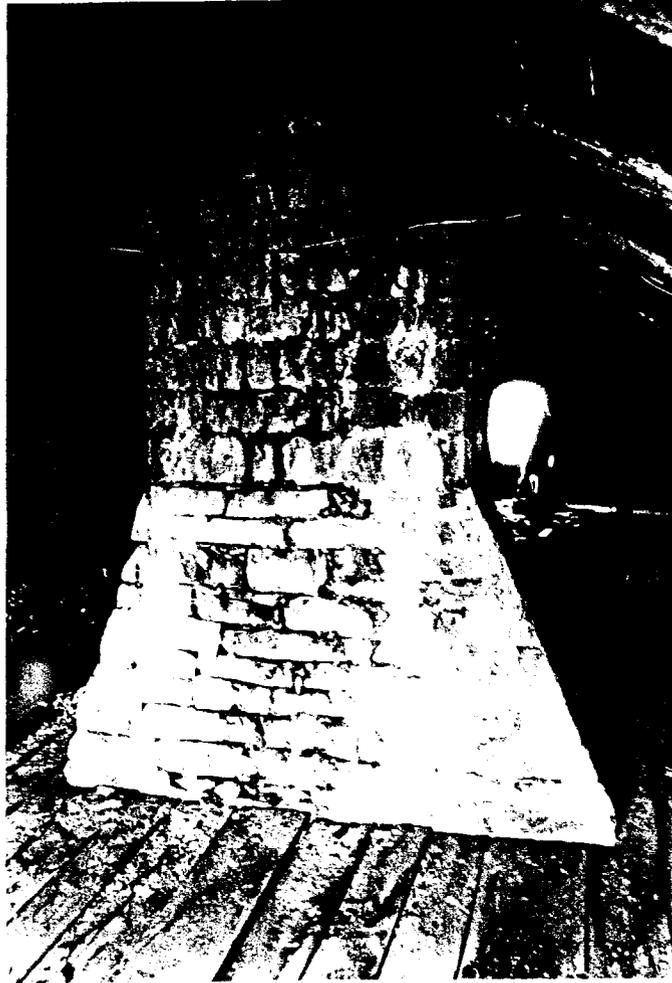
Samuels Apartments, detail of chimney in northern attic area (PAV)
